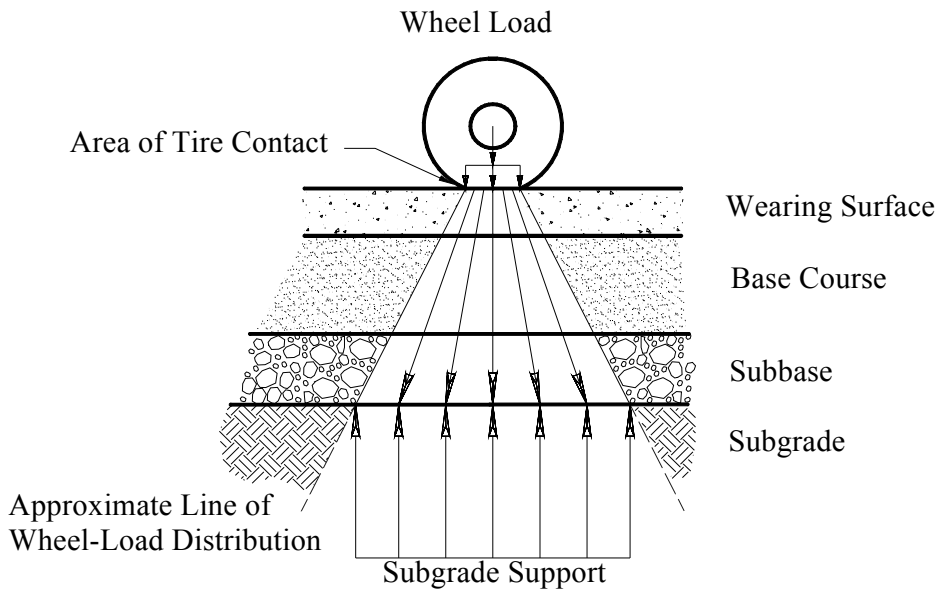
DISTRIBUTION OF LOAD STRESS IN FLEXIBLE PAVEMENT.
